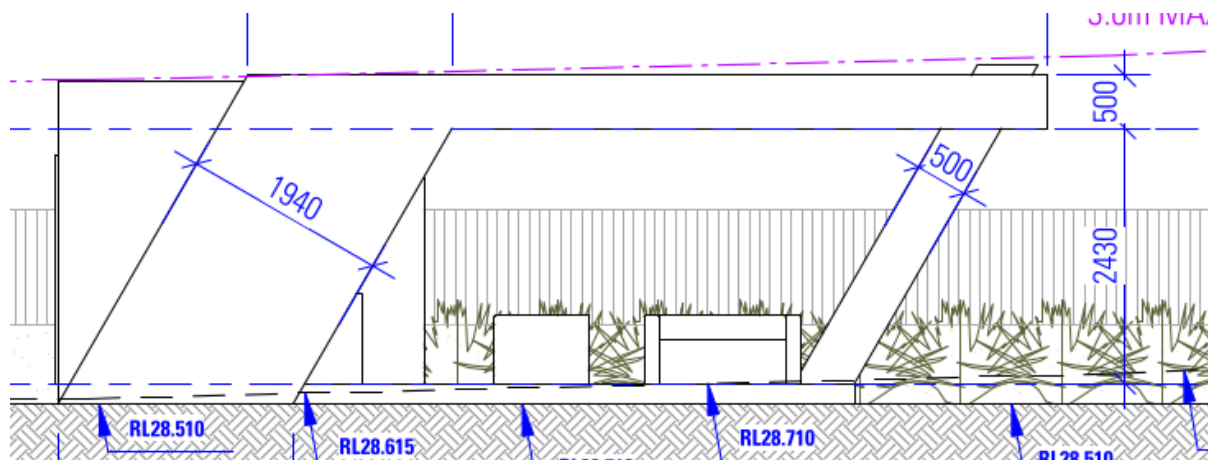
Extract of the western (front) elevation of the proposed outbuilding.
